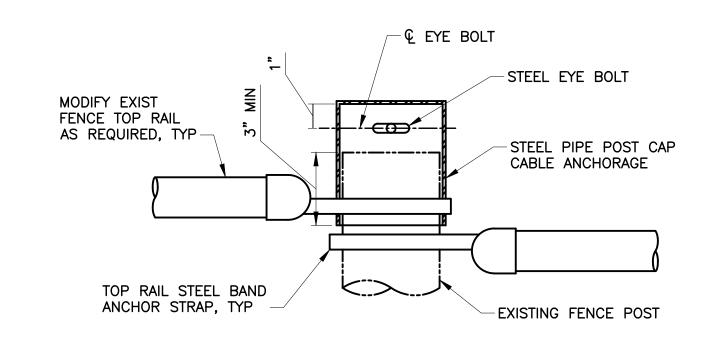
DETAIL STEEL PIPE POST CAP CABLE ANCHORAGE
